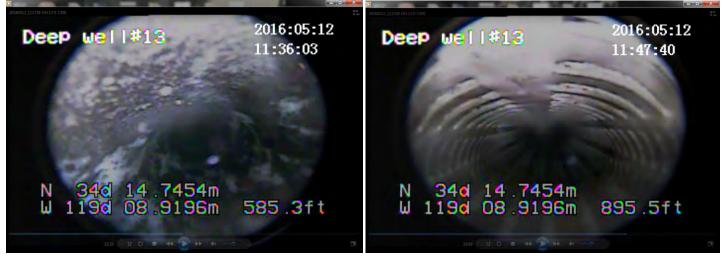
Down hole well inspection video of Well No. 13, dated May 12, 2016. Blank carbon steel casing is shown on the left, and louvered stainless steel casing is shown on the right.
